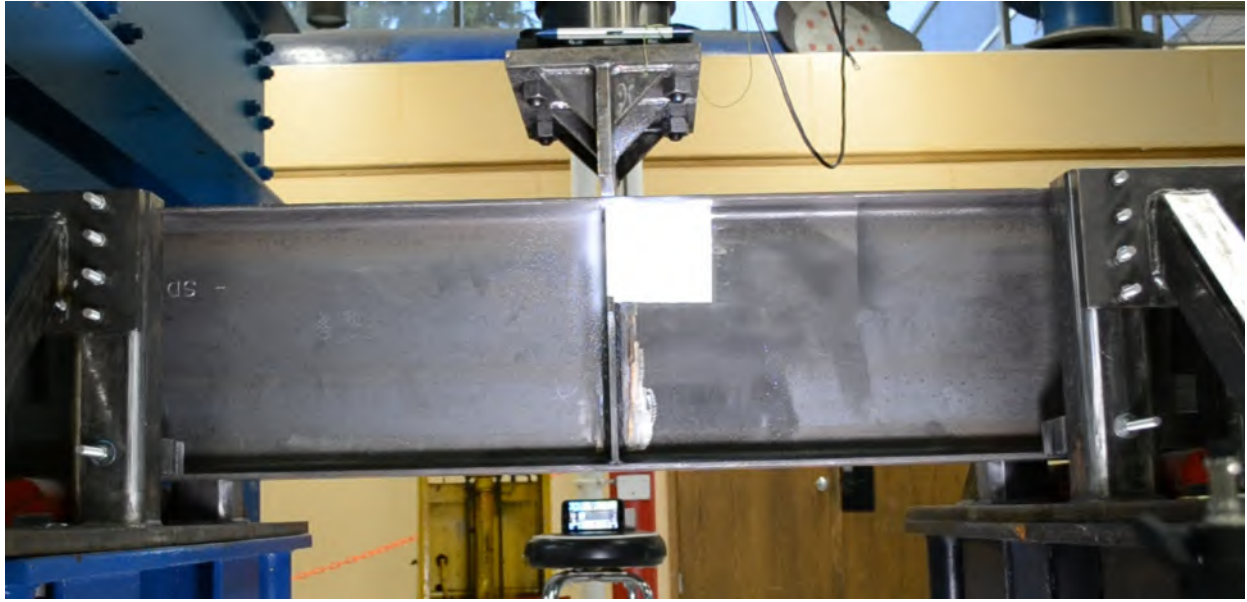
Close-up view of W16X31-SC-E3 after testing
